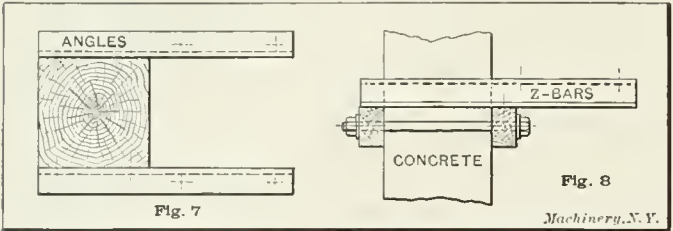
Angle Support for Attaching to Wooden or Structural Steel Column. Fig. 8. Z-bar Support for Concrete Columns where Bolts are not Incorporated in Original Column
